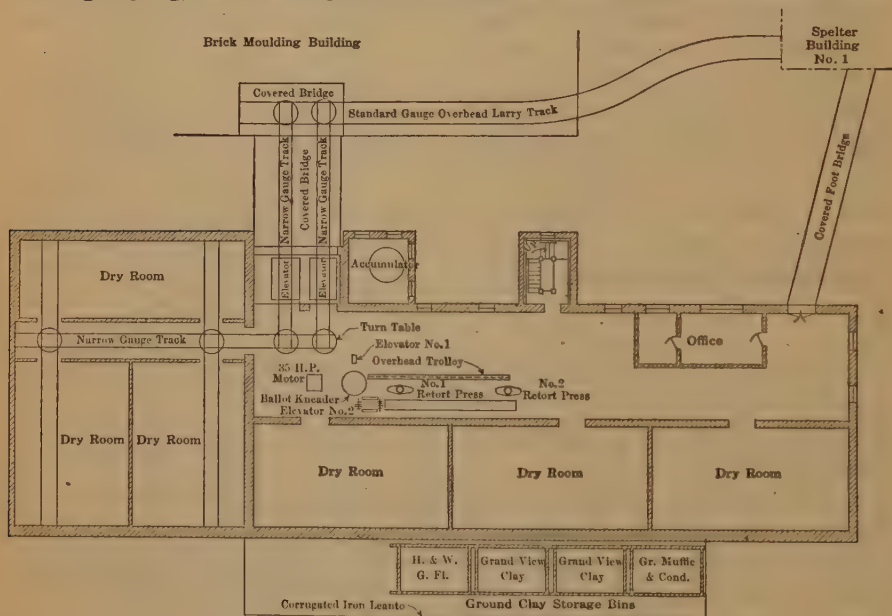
PLAN OF SECOND FLOOR OF POTTERY.
